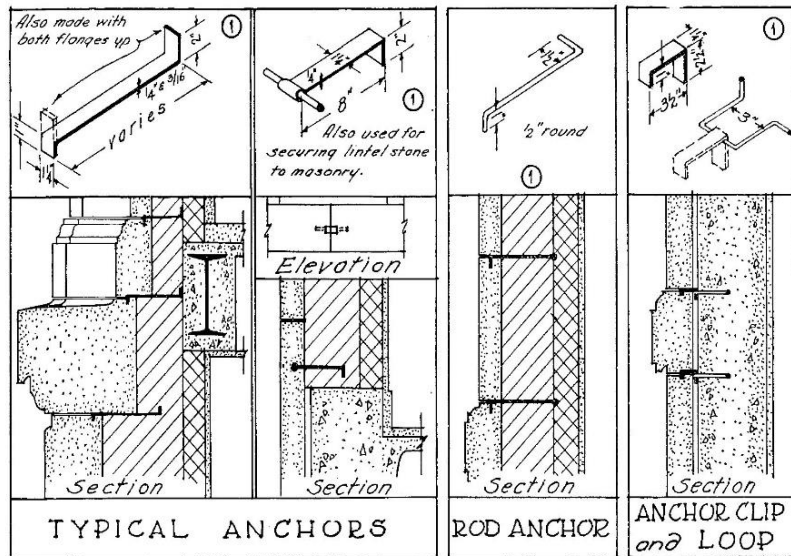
Typical anchors used to secure cut stone facing to an assortment of back-up walls. The flat steel bar with upturned or downturned ends to the left the image, and the rod anchor would both be suitable to the relatively simple stone application on the facades. Source: *Traditional Details for Building Restoration, Renovation, and Rehabilitation. 1932-1951 Editions Architectural Graphic Standards* pg. 63. Ramsey Sleeper. John Wiley and Sons Inc.
